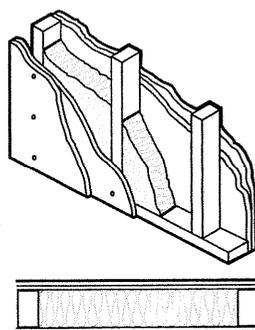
Conventional wood stud construction, double layer gypsum wallboard each side. Increased mass boosts STC rating to 46.
